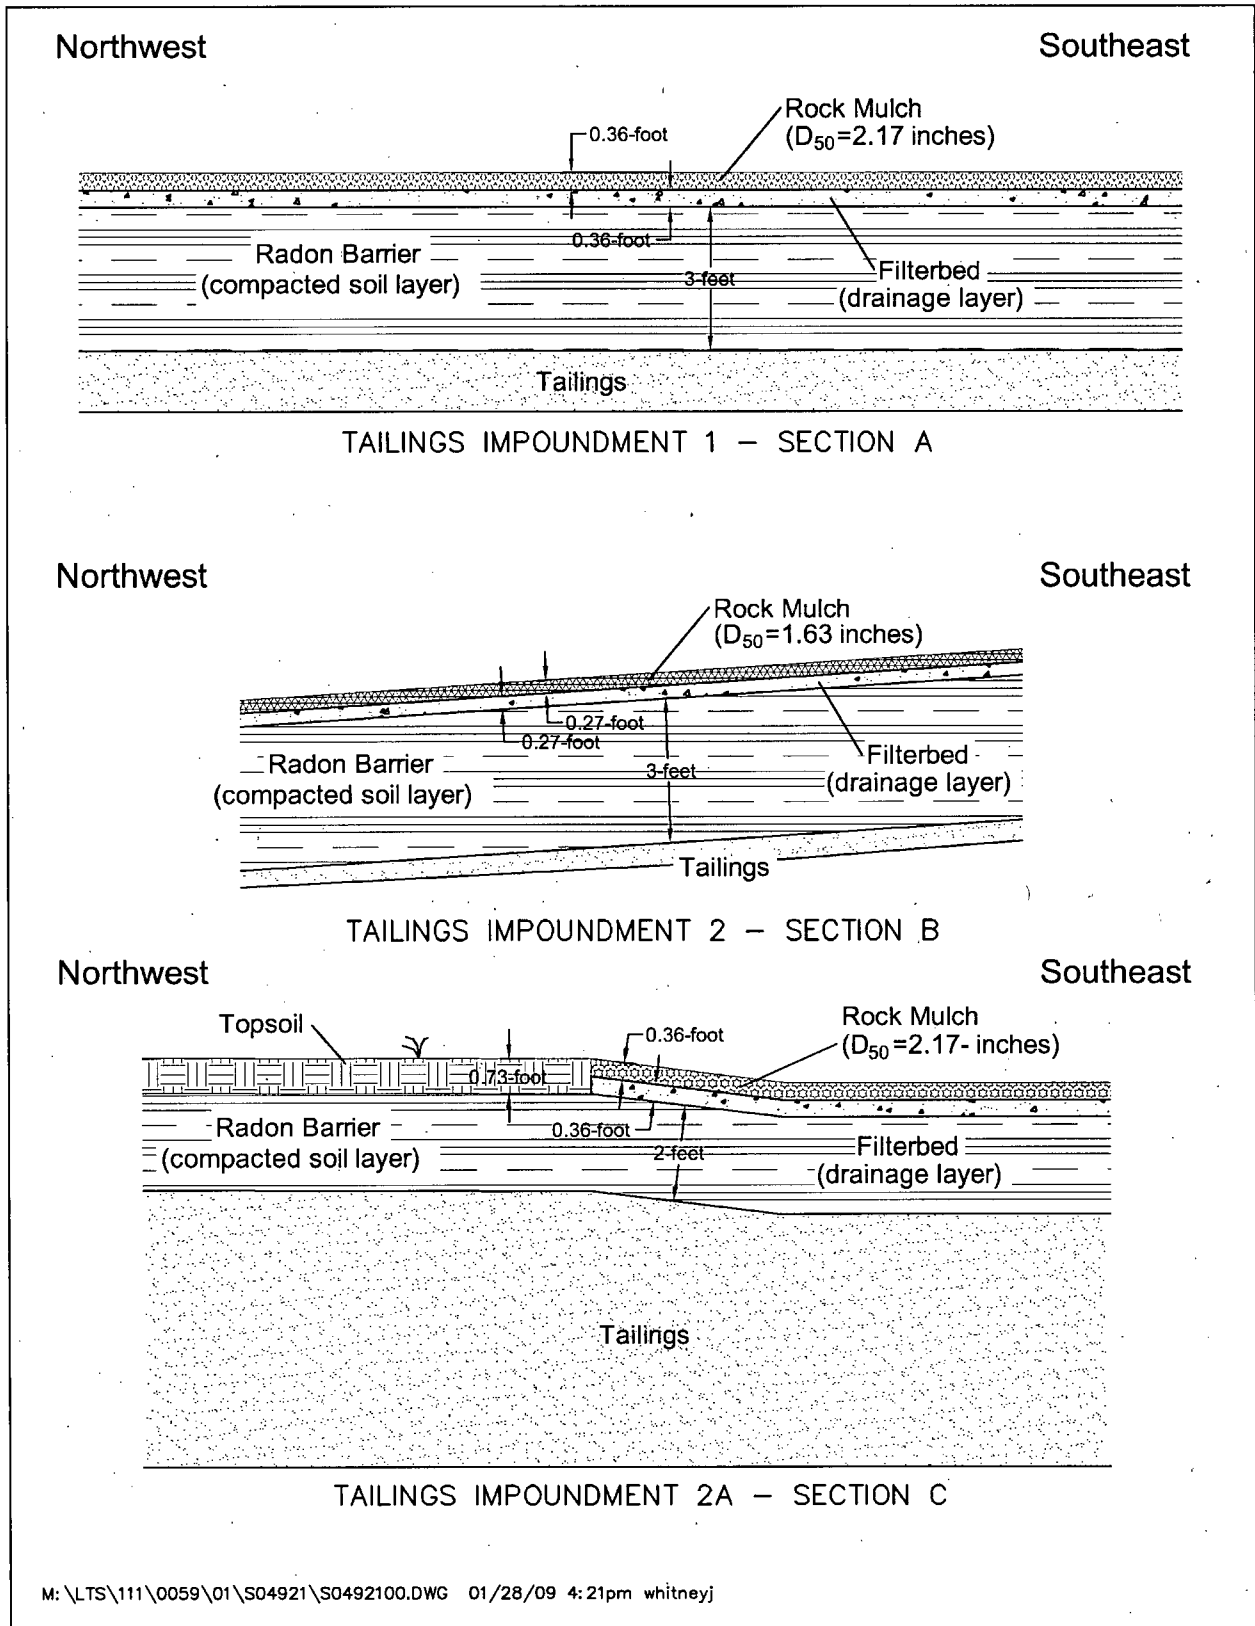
Cross Section of the Engineered Covers on Tailings Impoundments 1, 2, and 2A at the Gas Hills North, Wyoming, Disposal Site
